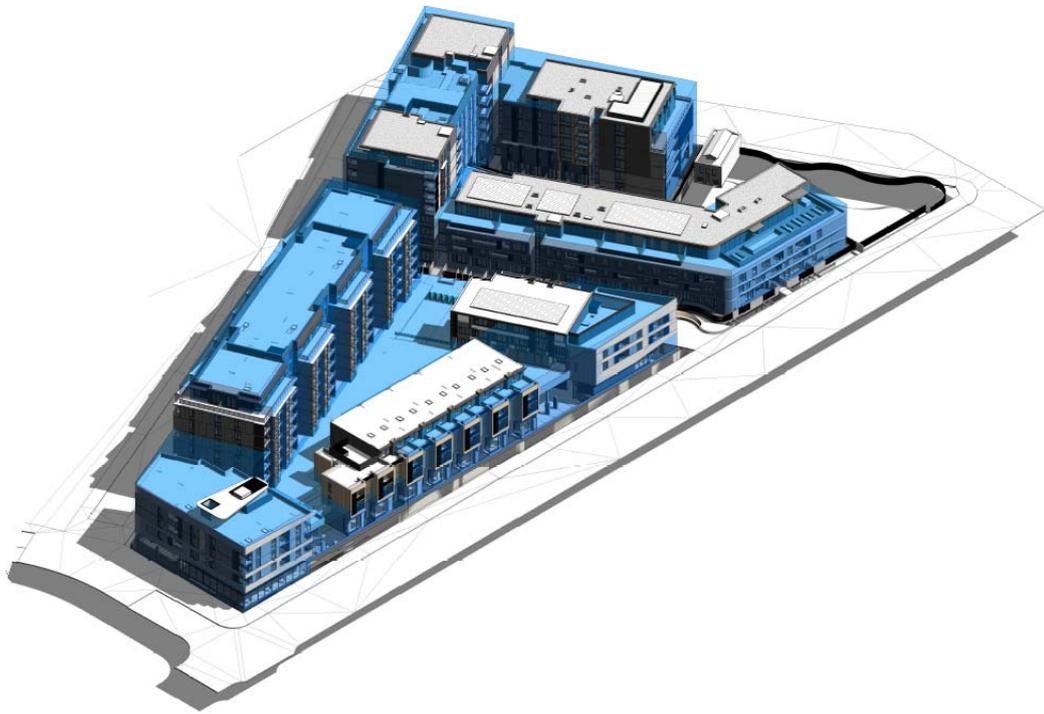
Axonometric drawing of the detailed design proposed for Blocks B and C within the existing Concept Approval building envelopes, as viewed from an elevated position to the south-east
